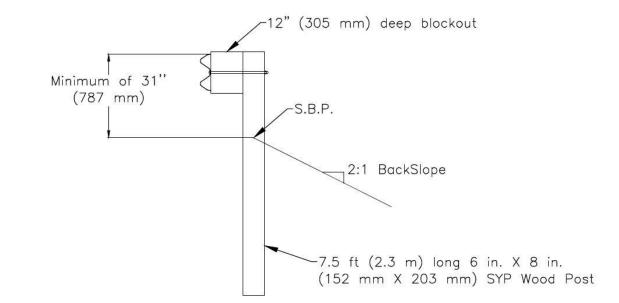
SYP Wood Post MGS Adjacent to 2:1 Fill-Slope
